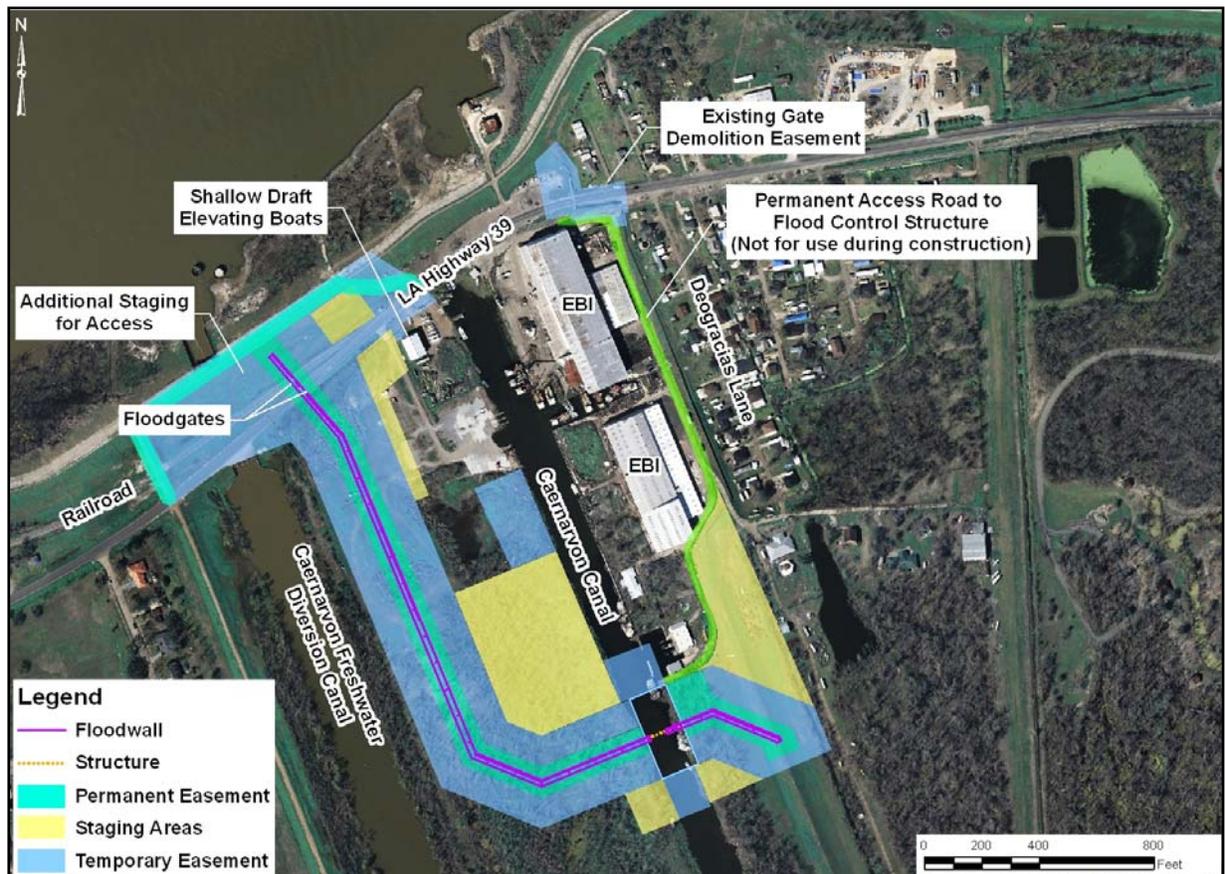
Proposed Action - Realignment of Caernarvon Floodwall to West of SDEB Property (with Proposed Staging Areas, Permanent Easement, and Temporary Construction Easement)
